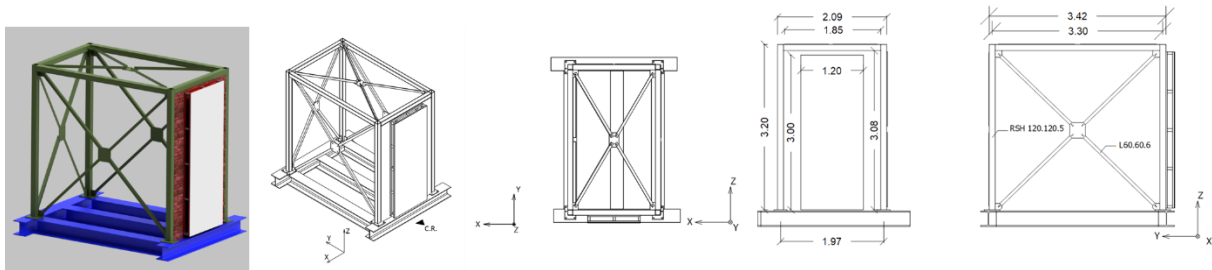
STEEL FRAME - INFILLED WALL FITTED WITH SMARTWALL AND PLAN VIEW OF SPECIMEN AND ELEVATIONS Z-X AND Z-Y.
